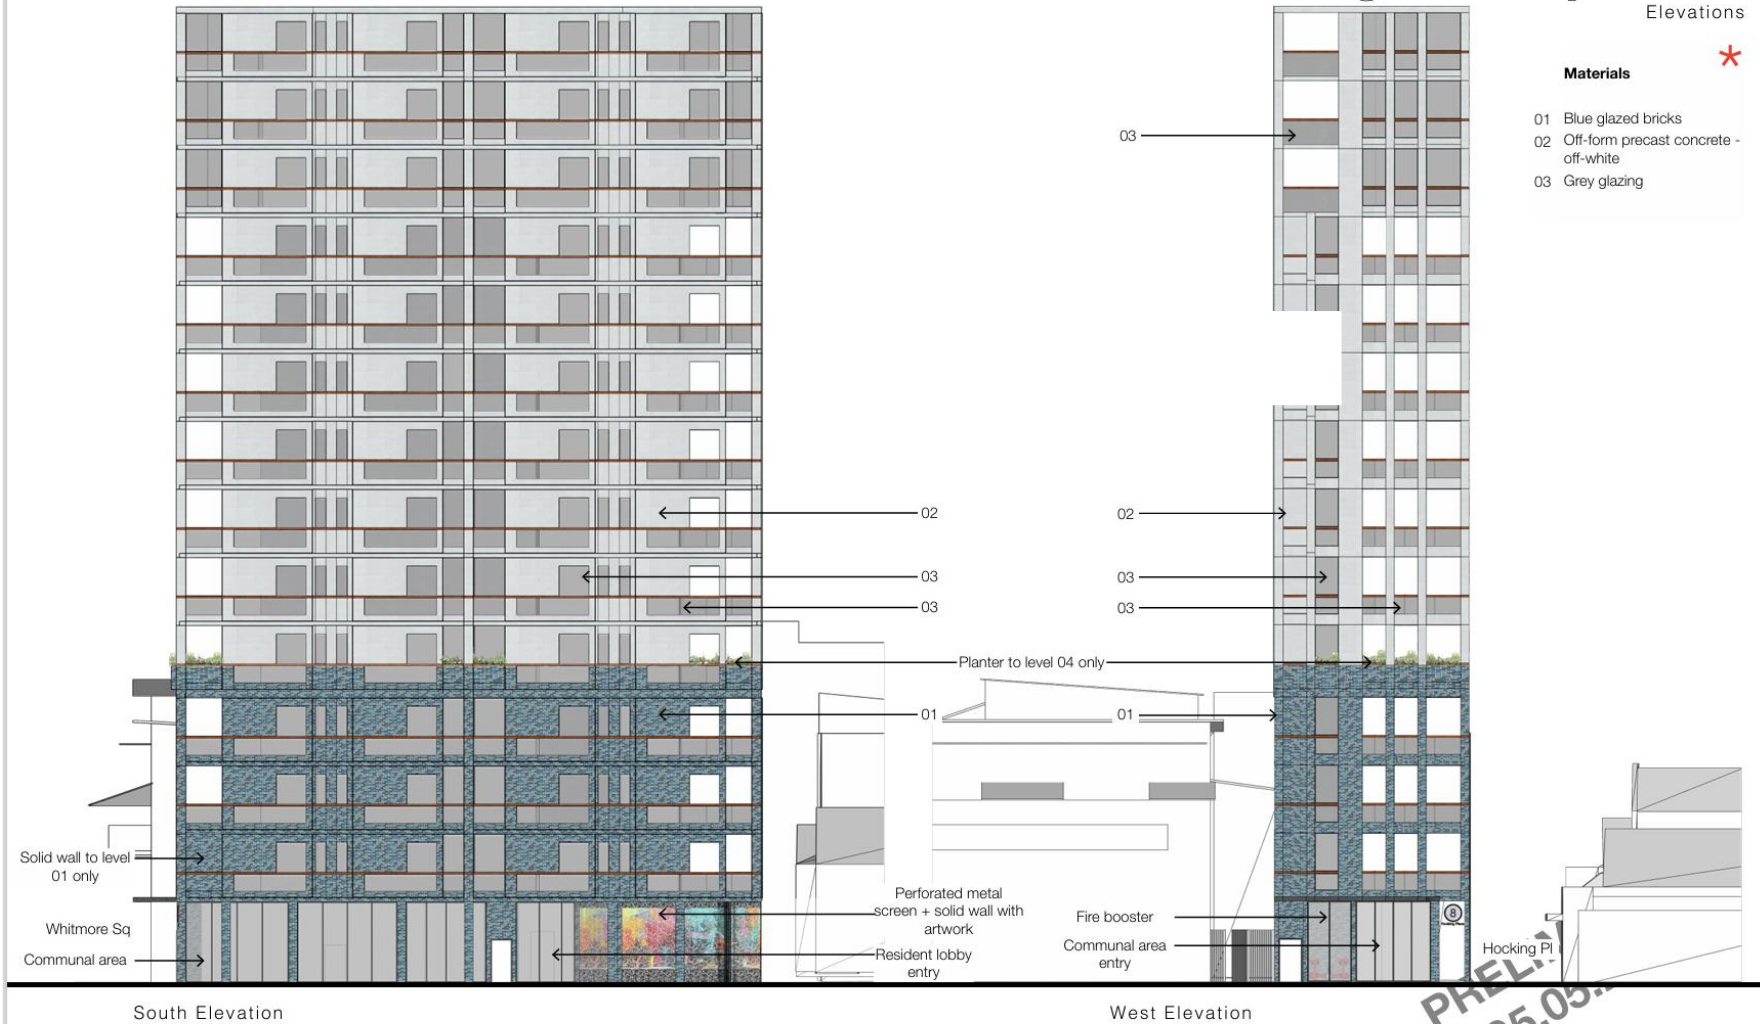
Elevations (South and West) for the Development. Reproduced from concept plans by the Architect (Tectvs Architecture, May 2025).
